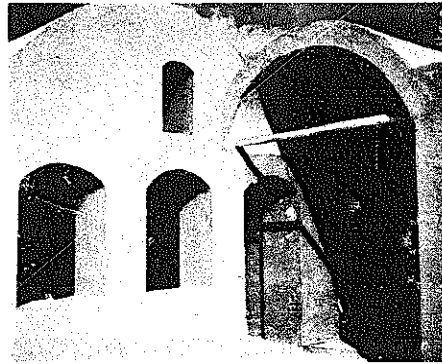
Mud Brick Vault and Dome Housing, with Wood Tie Beam
